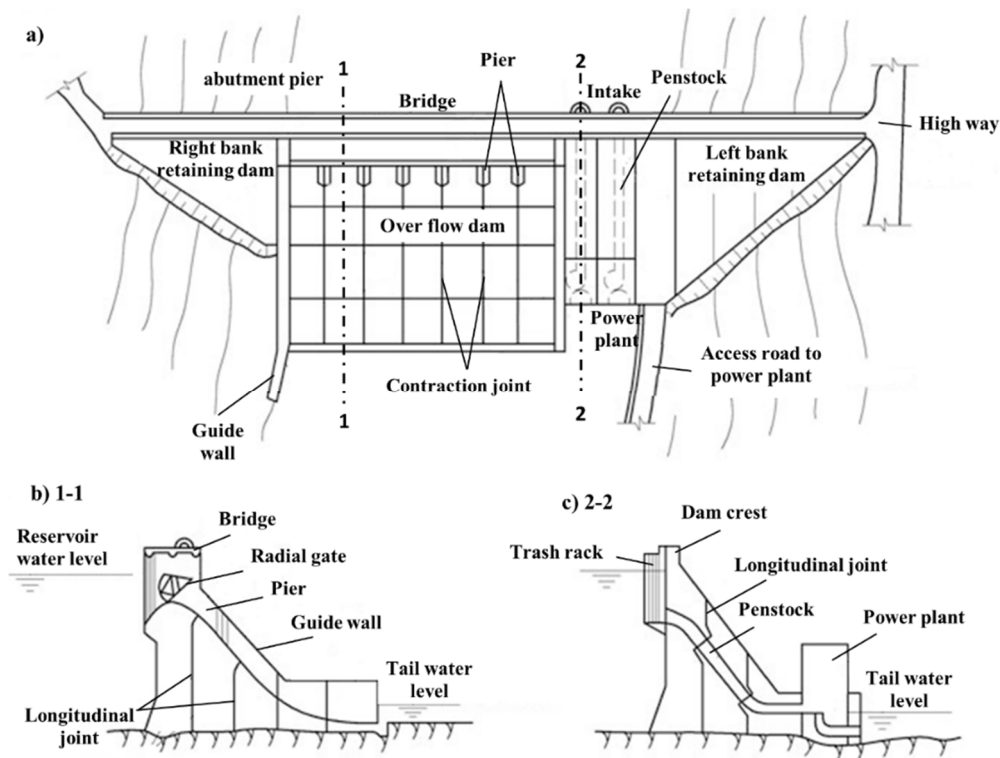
a) Top view of gravity dam; b) Cross section of over flow dam; c) Cross section of power plant.
